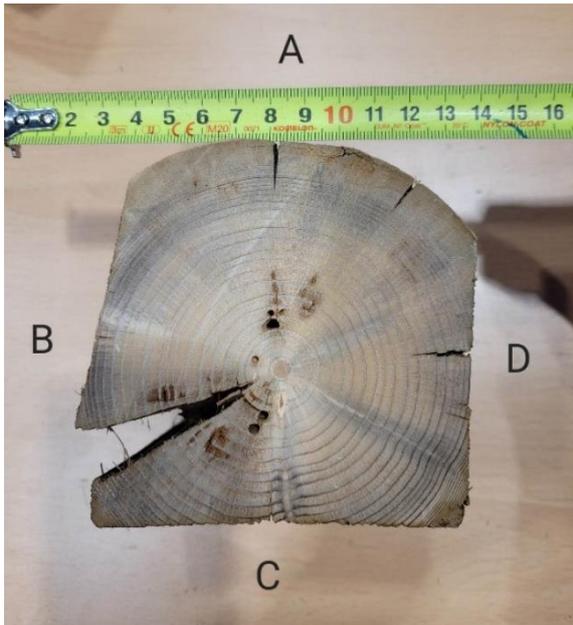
Specimen 1 CS with visible insect damage
